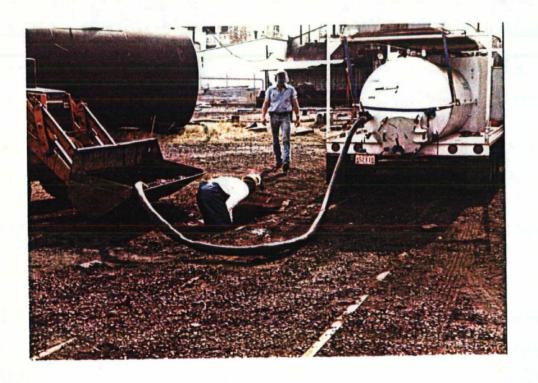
Removing Solids from Separator Inflow Line Basin. 4/30/85
